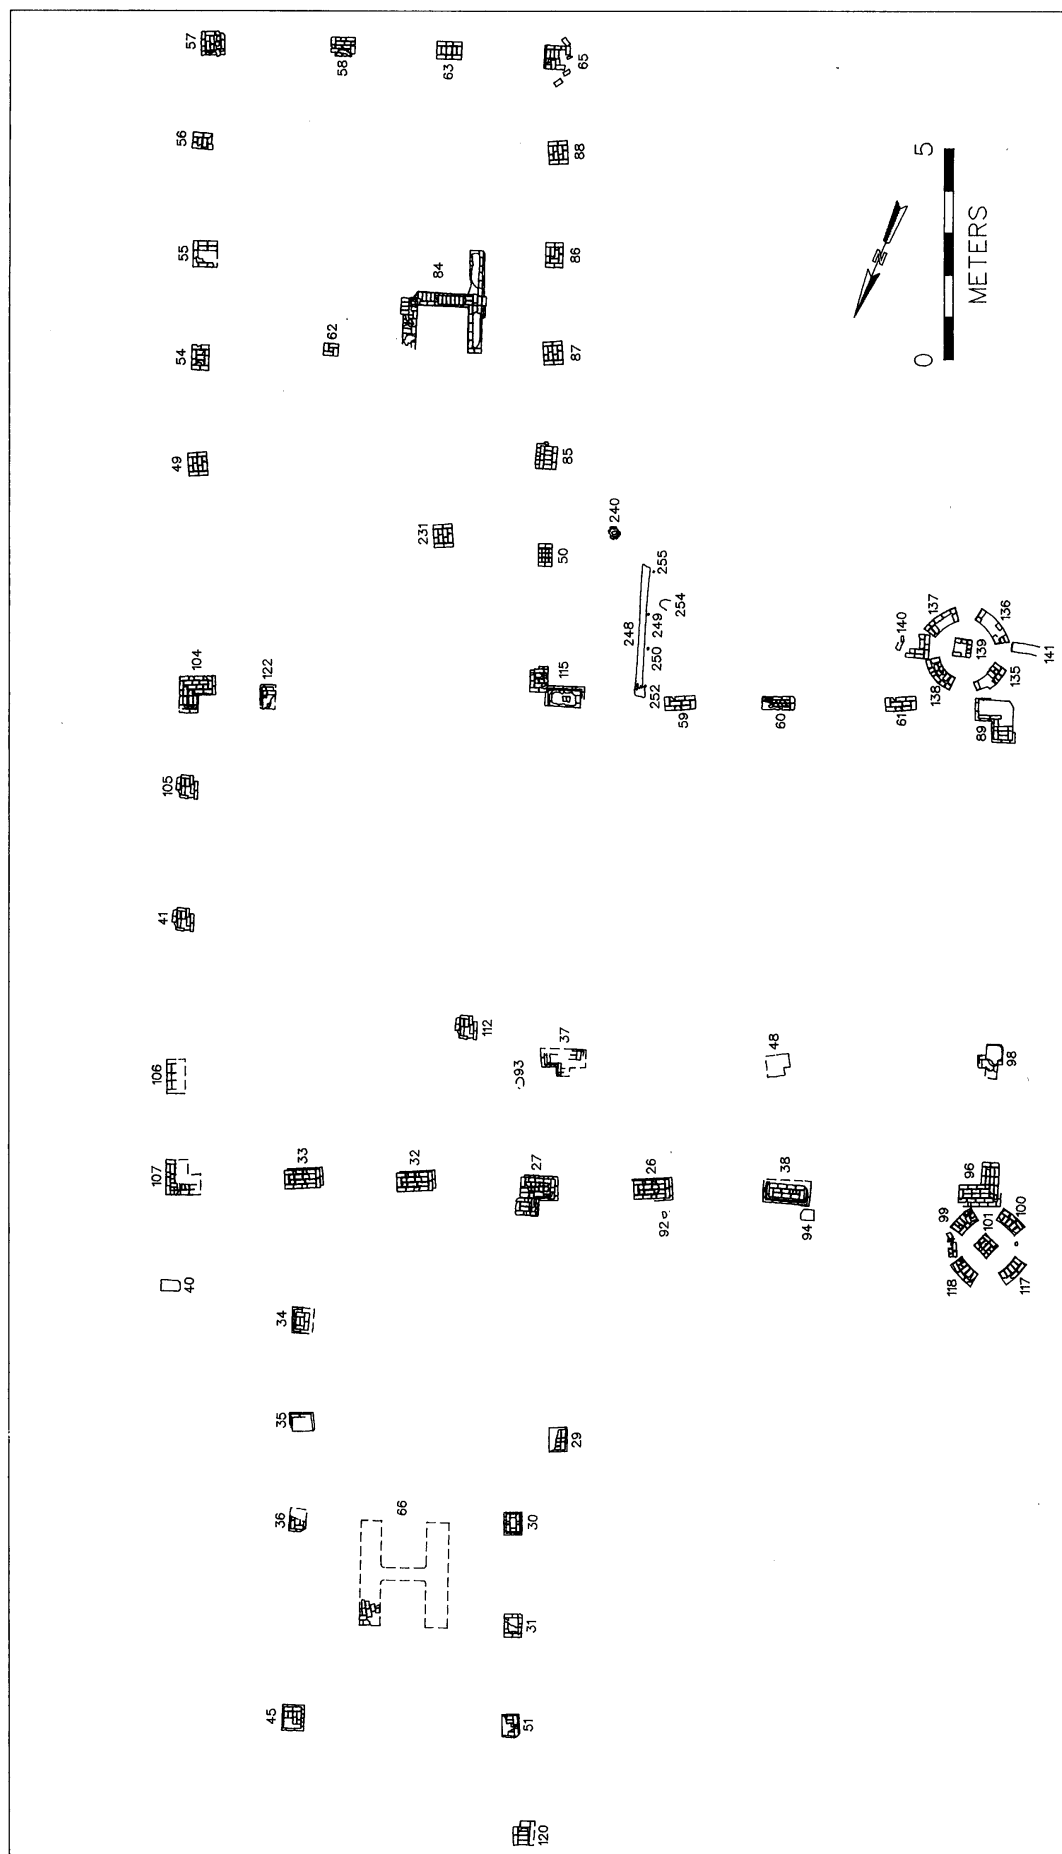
Plan view of the Main House at Nina Plantation, showing the central core, as well as the north and south wings of the structure.
